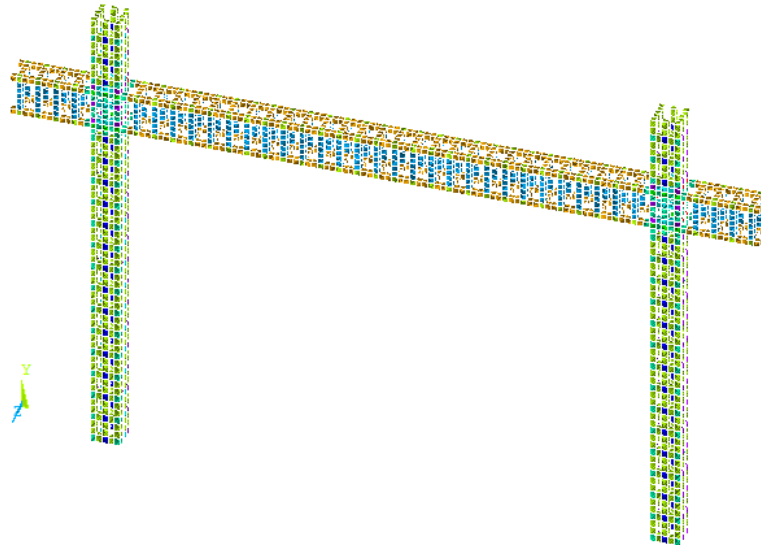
The smeared rebar elements in Specimens 1 and 9, Mehrabi's test
